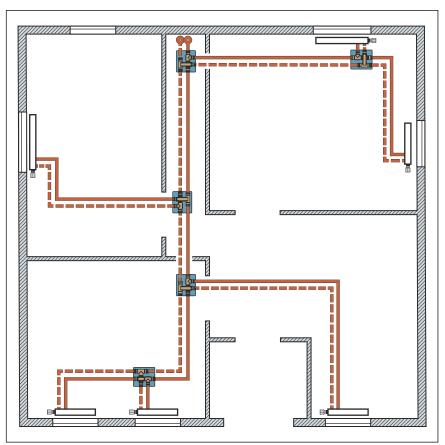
Sanpress cross T-piece, example of application, floor plan
